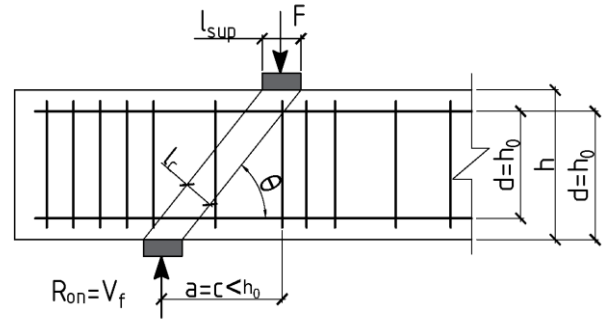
The calculated scheme of bearing capacity of the supporting section of the basalt concrete beam with a small span of the cut ($a < h_0$) on an inclined compressed strip between the concentrated force and the support.
